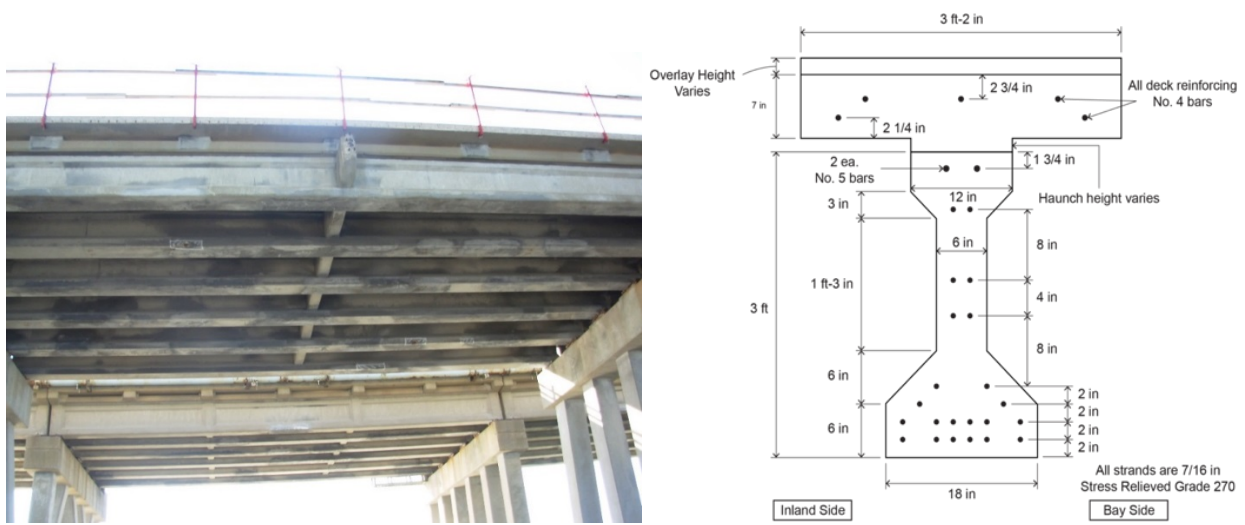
Typical Deterioration on the Lesner Bridge (left) Cross-section of Lesner Bridge I-Beams (Right)
